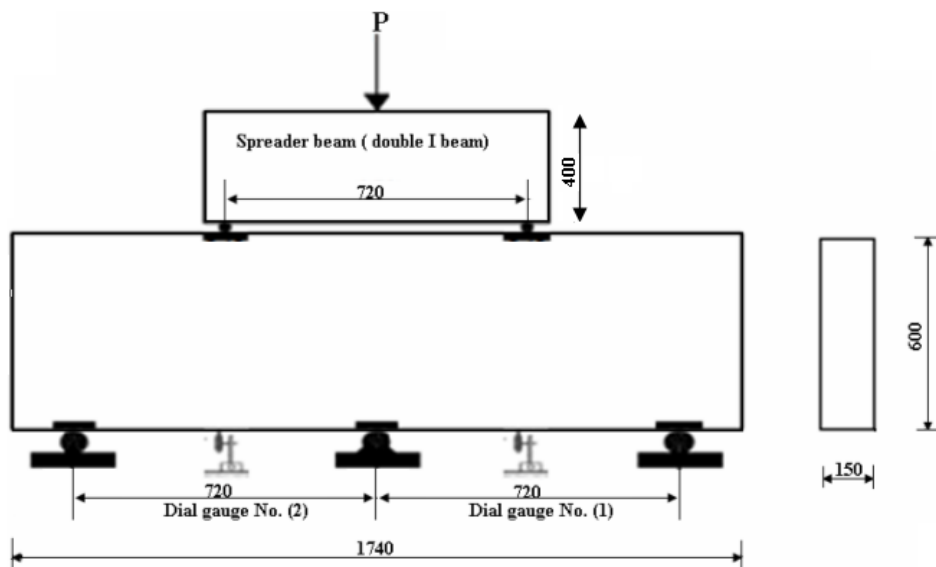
Dimensions and test set up of tested beams (Note: all dimensions in mm)
